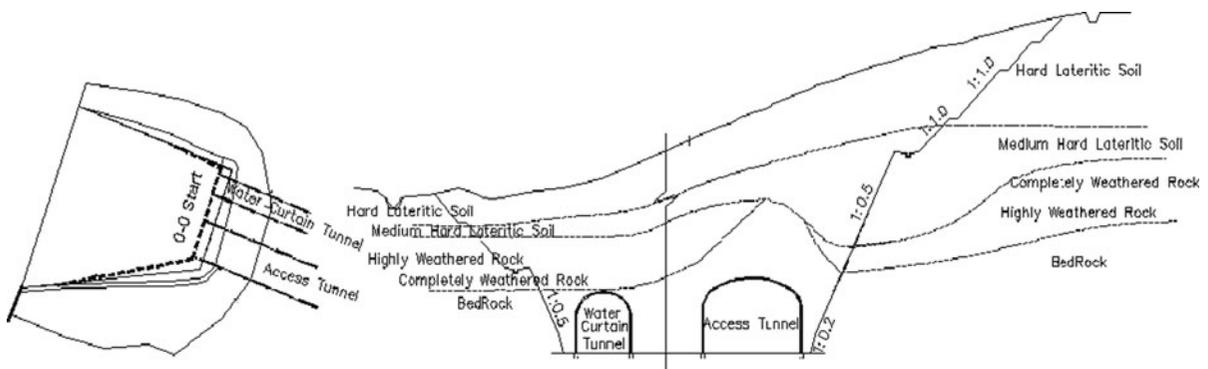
Plan and section of portal along with access tunnel and water curtain tunnel
